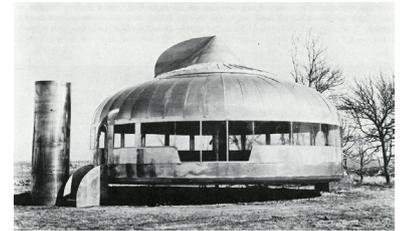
“Finally assembly of Dwelling Machine completed [...]”
